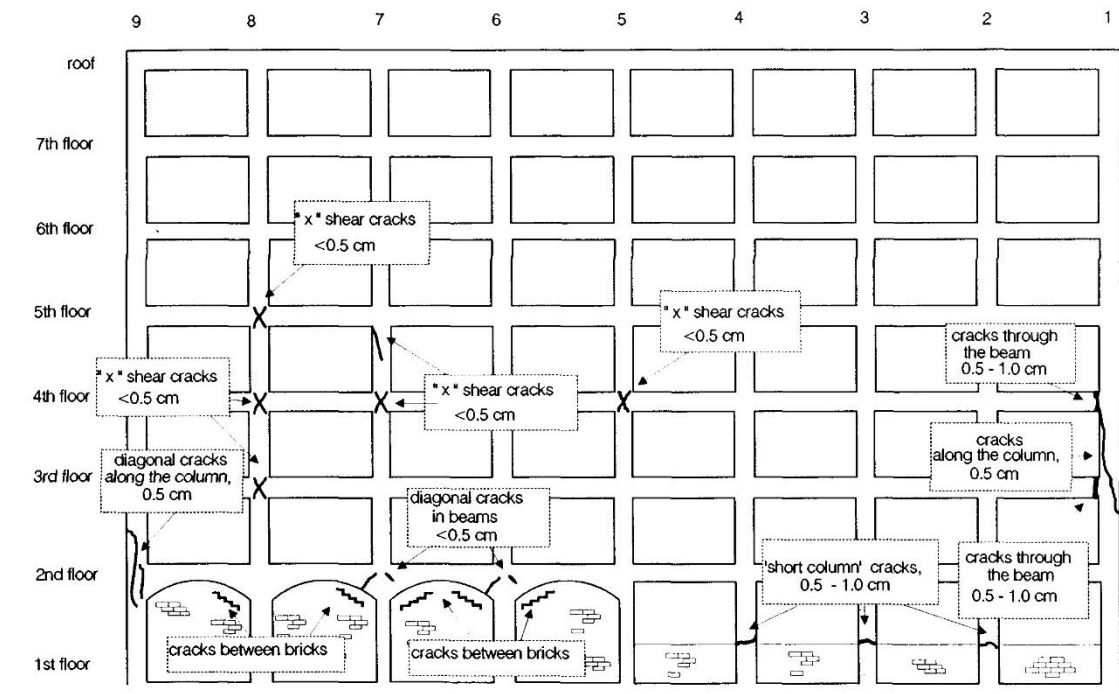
Structural Damage, North Frame (Trifunac et al., 1999)
